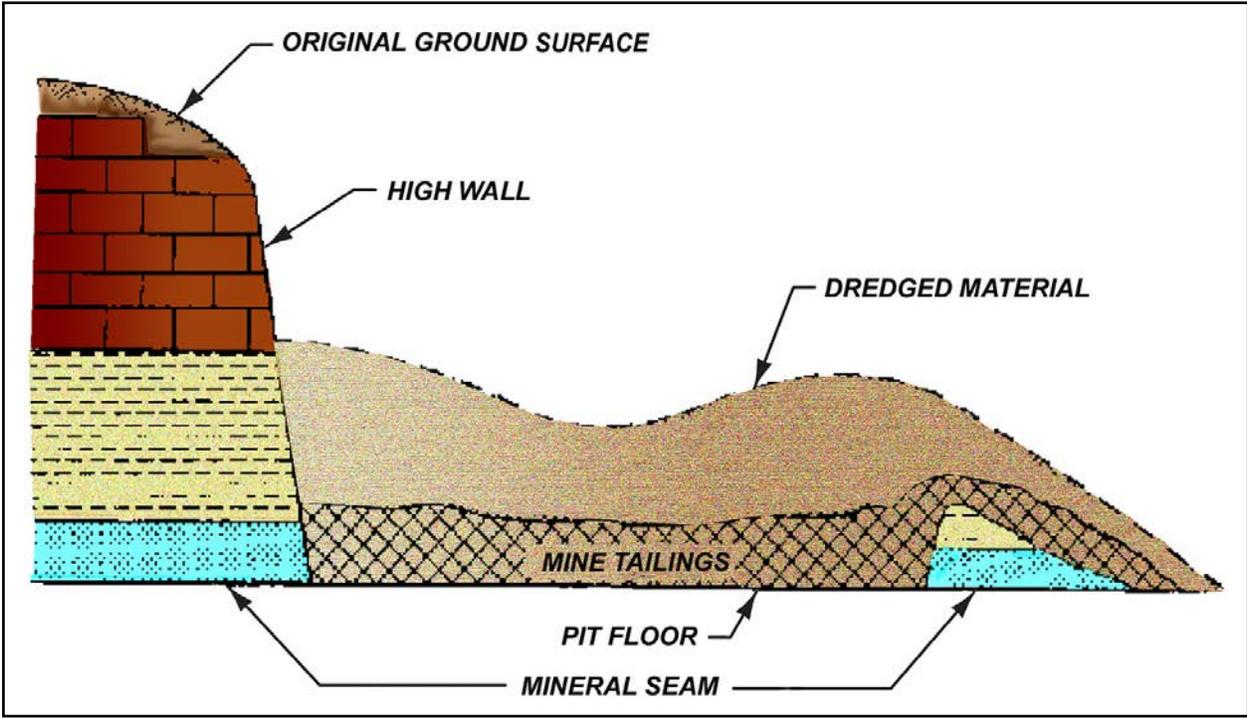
Cross-Sectional View of the Georgia V-ditch Backfill Technique
